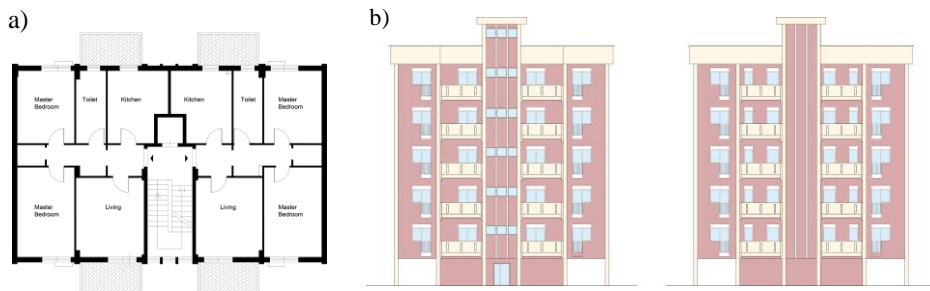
Typical floor plan of the case study (a); North façade of the building on the left and south façade of the building on the right (b).
